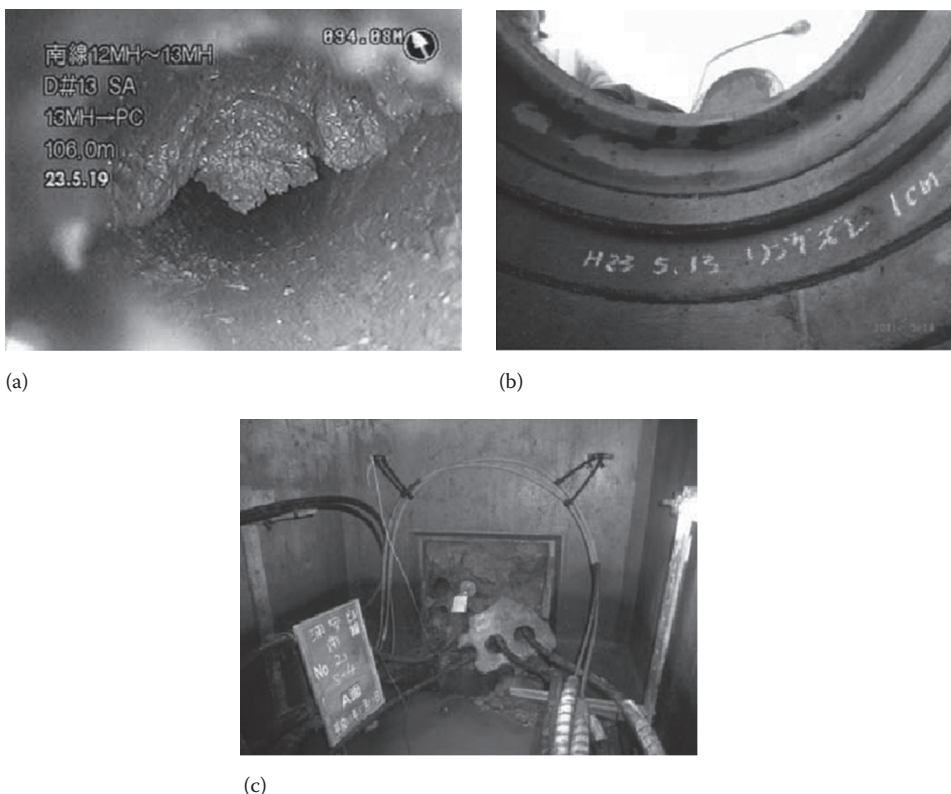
Representative damaged state due to tsunami: (a) eroded conduits and manholes; (b) conduits attached to the bridge that are washed away; and (c) destruction of conduits due to floating wreckage.
